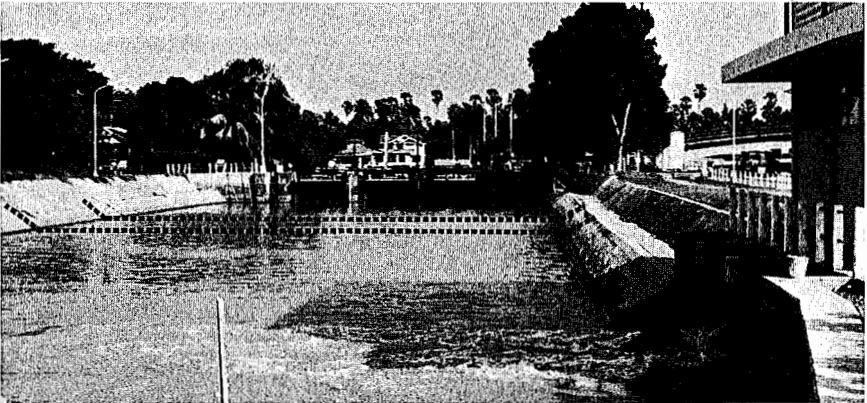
Existing facilities looking toward river showing present pump station to the right and control structure in background. Location of new pump station shown in dashed lines.
